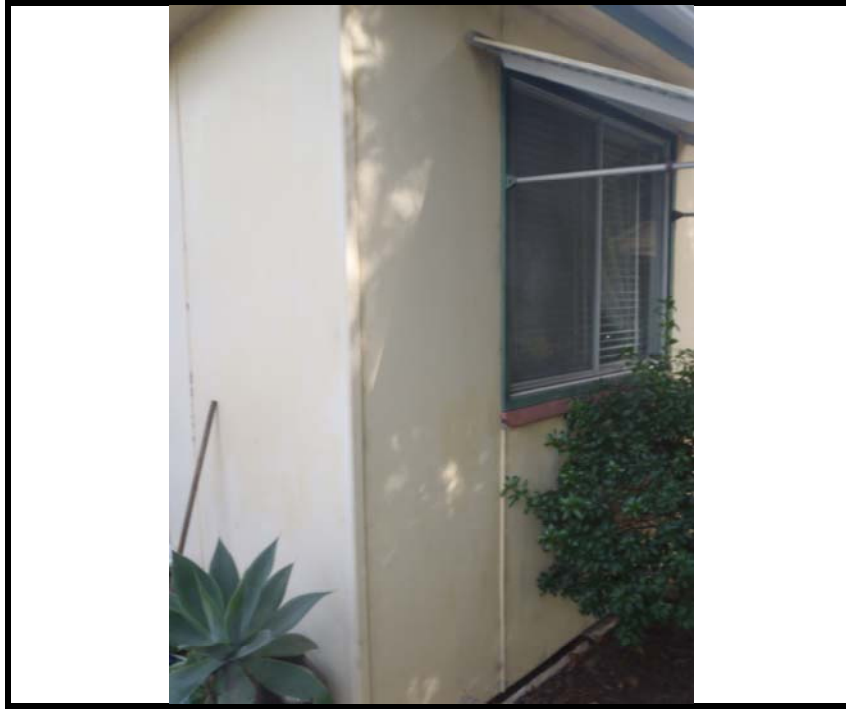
Section of the ACM sheeting exterior walls (including corner moulding) at 1 McLeod Road
